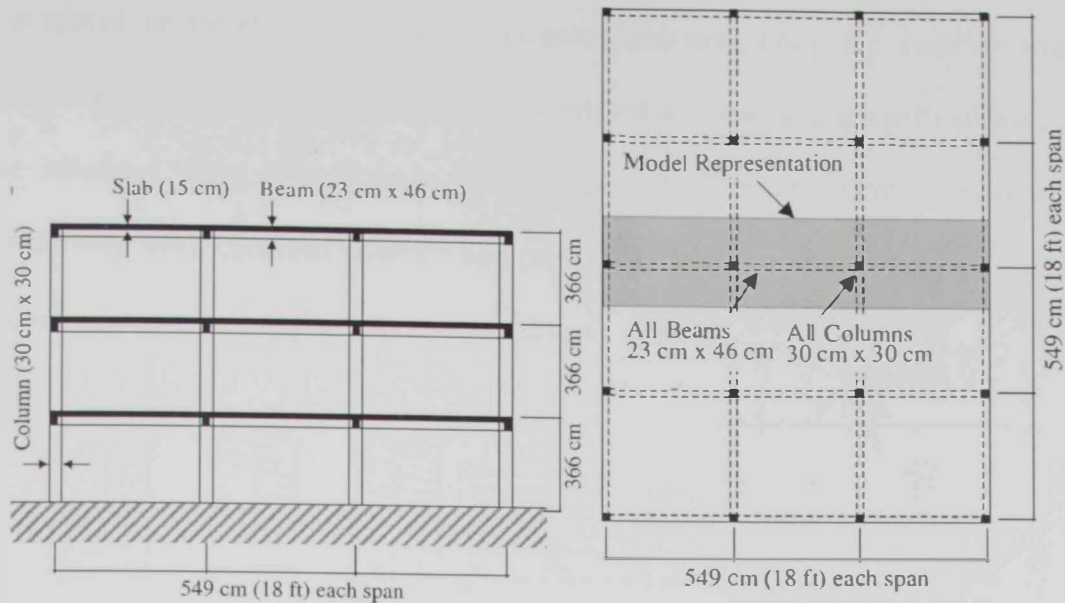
Sectional elevation and plan of the prototype structure used for the Zeus-NL verification (Bracci et al., 1992; Kwon and Elnashai, 2006)
